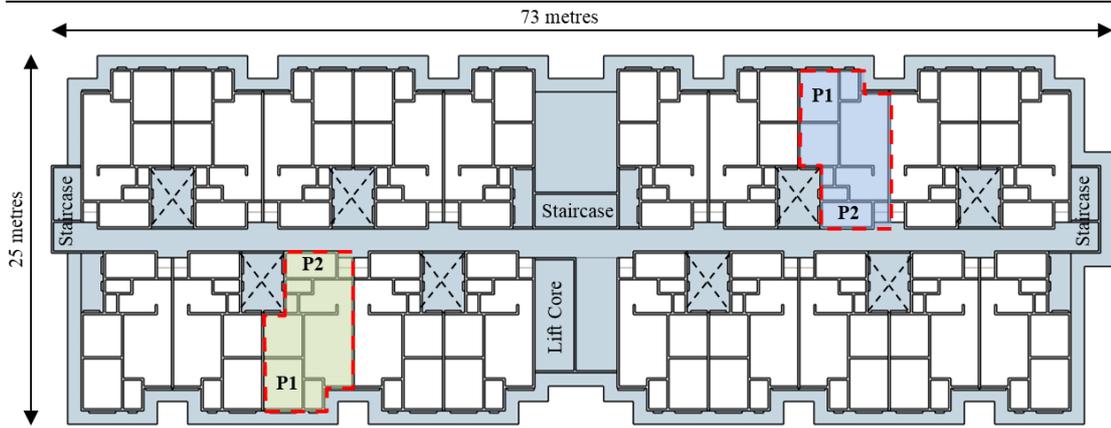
Typical floor plan of PPR Seri Aman (Second Generation)
